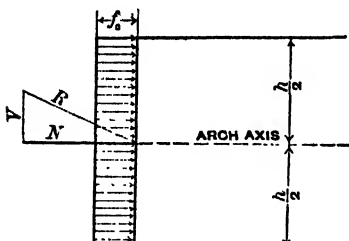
Stresses Caused by a Force Acting in the Middle of Plain Concrete Section. (See p. 560.)
